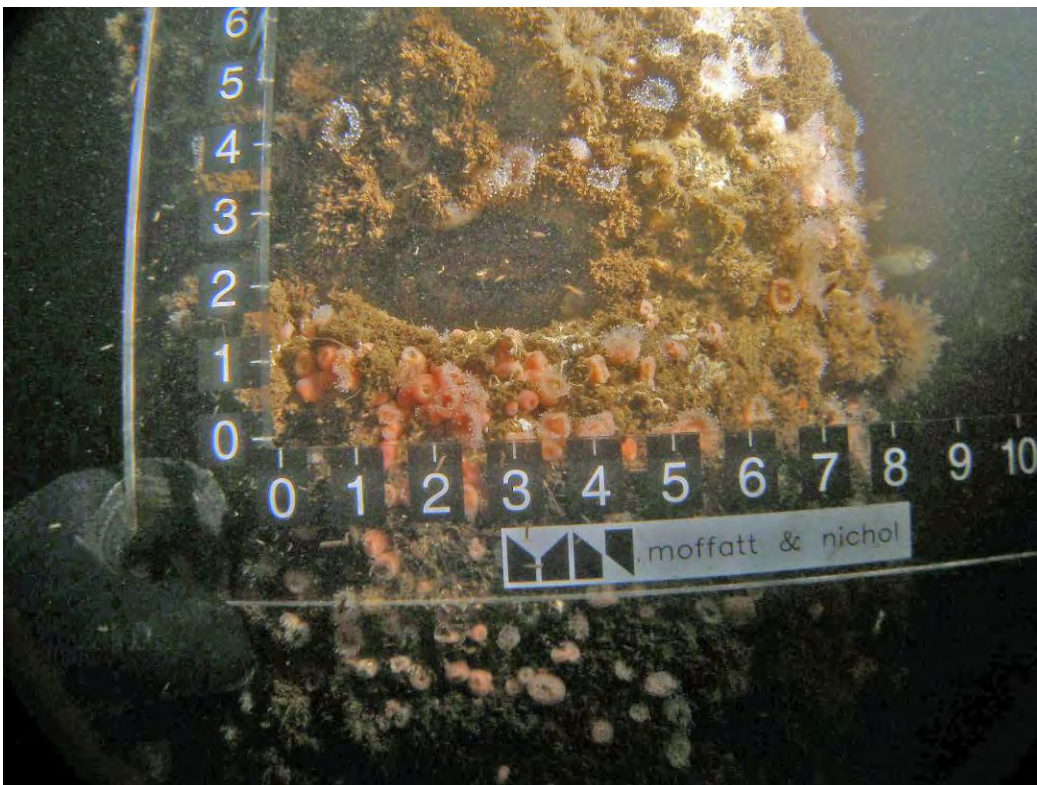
Bent 76, Pile North of 20, portion of pile 5% section loss
